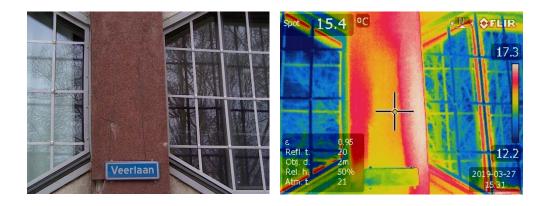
Photograph of a concrete column with vertical cracks and spalling (left). Infrared image of the same picture showing different temperatures in the damaged areas of the column. Fenix Building, Rotterdam (2019)
